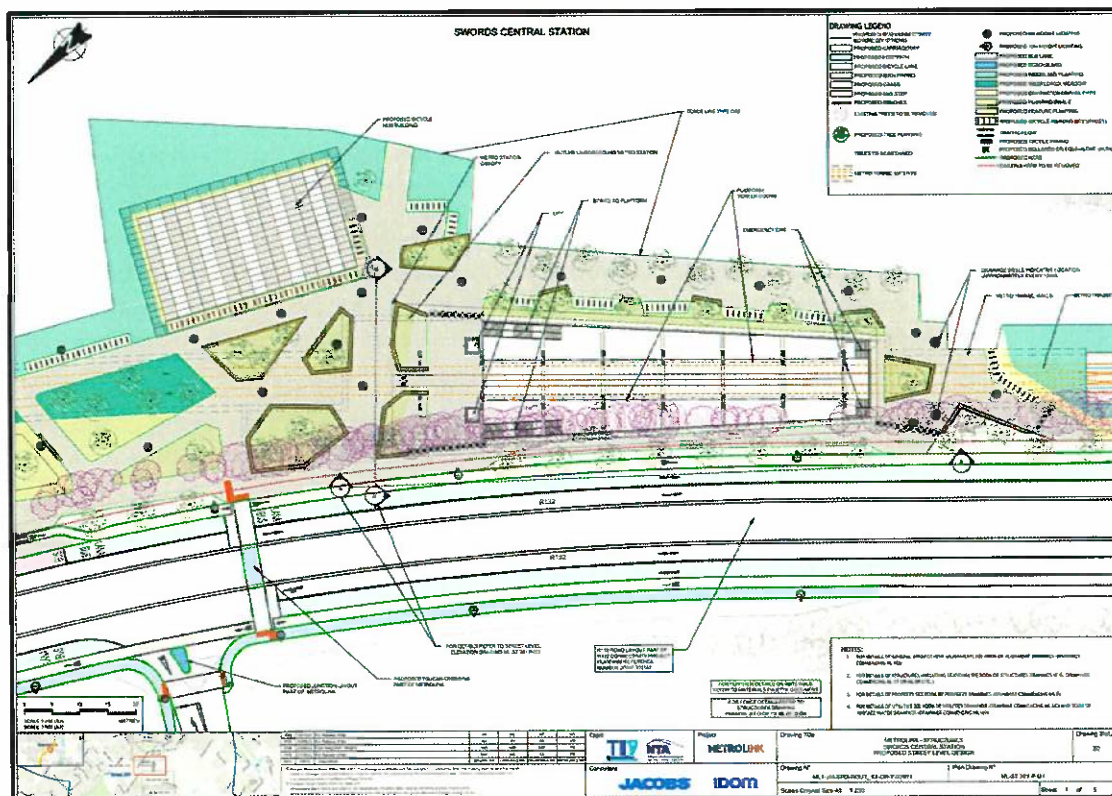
Metrolink Swords Central – Proposed Street Level Design (Pavilions lands to west of R132. Note proposed toucan pedestrian crossing south of Pavilions R132 access road)
